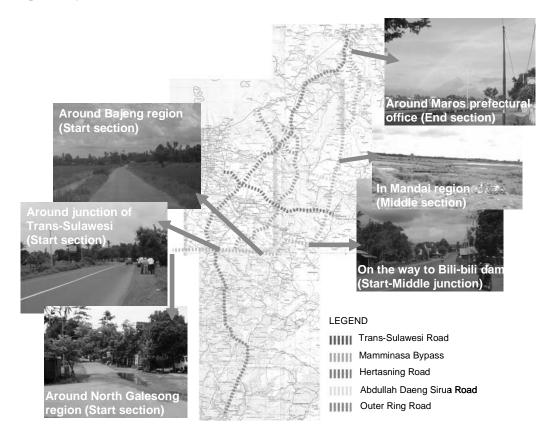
Typical Site Conditions of Mamminasa Bypass for EIA
